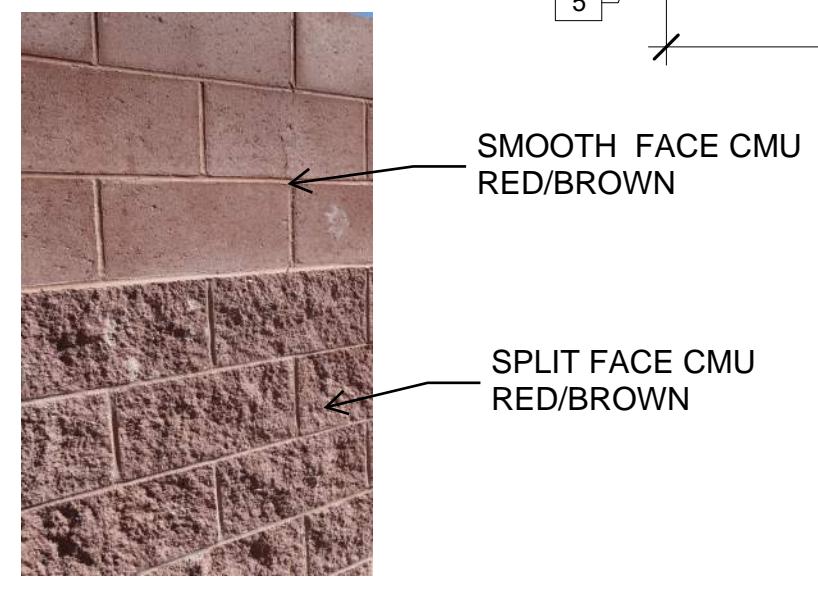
PHOTO OF EXISTING PUMP STATION. THE NEW ARSENIC TREATMENT FACILITY WILL MATCH THE CMU COLORS AND ROLL UP DOORS.
